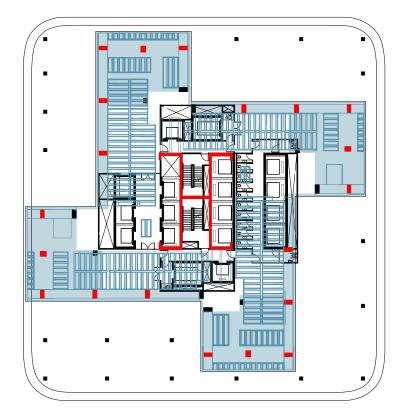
Structural overlay showing the extent of existing slab and structure retained with central expanded core layout
